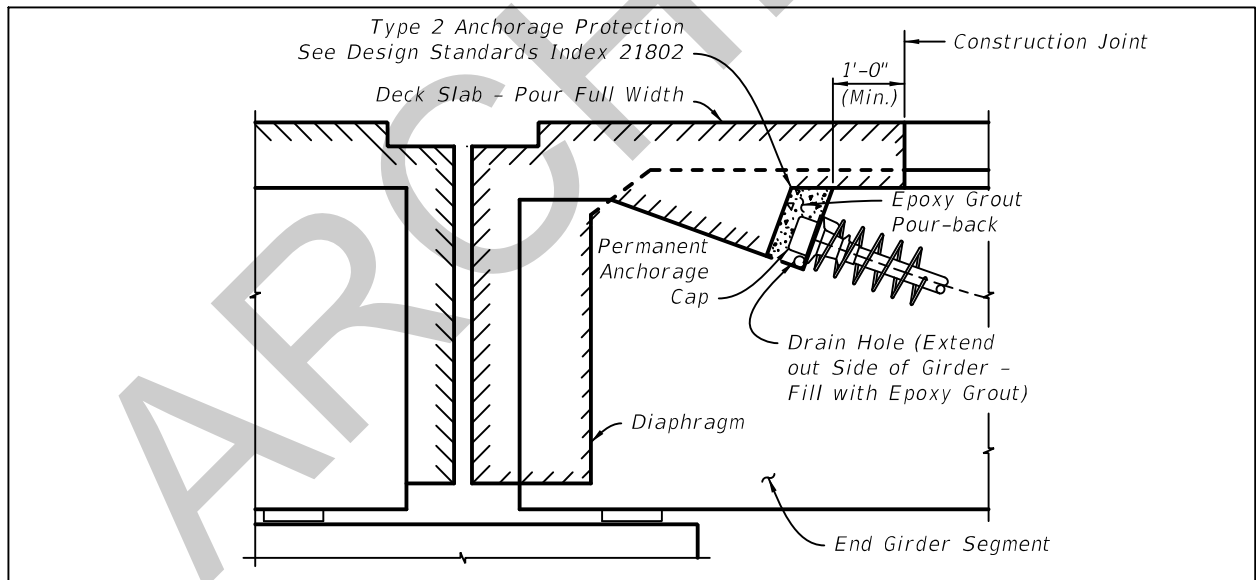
Detail of Anchors Located Along Top of End Girder Segment
